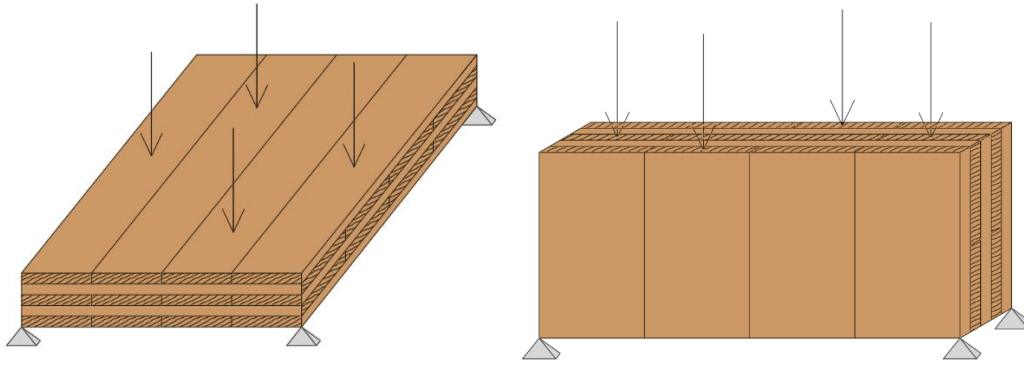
Two ways of loading CLT panels: plane and panel actions.
